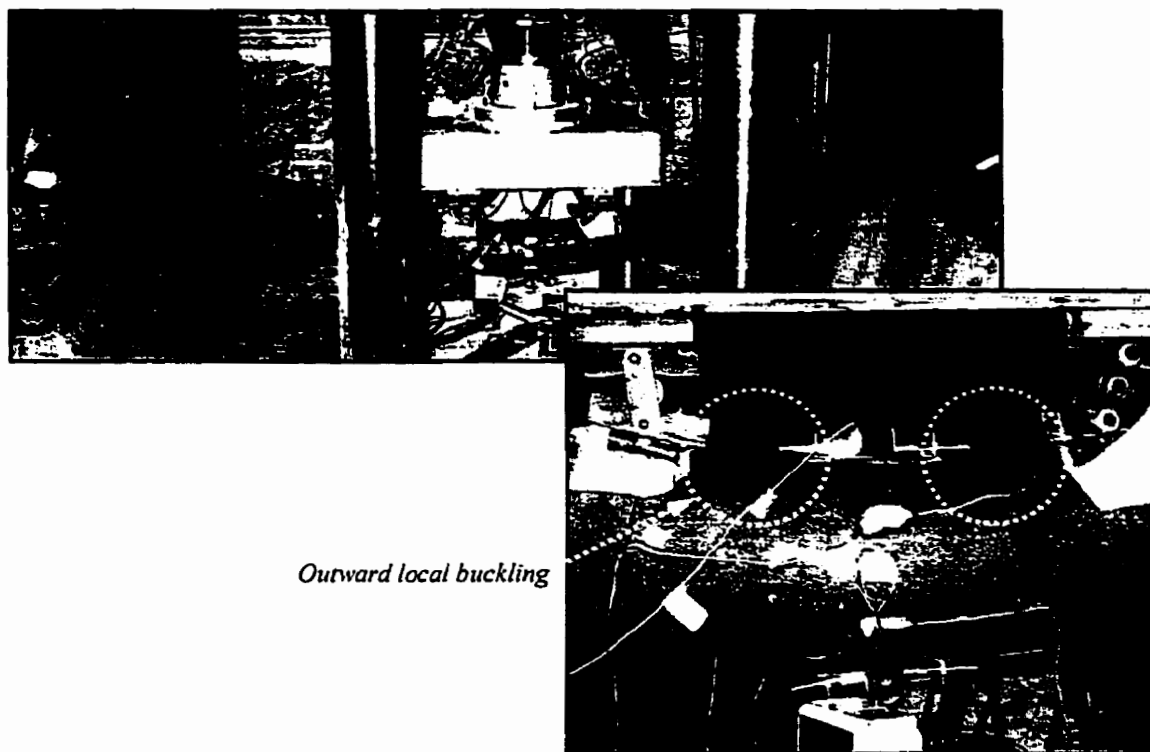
Failure mode of concrete-filled steel tube, beam 1b
